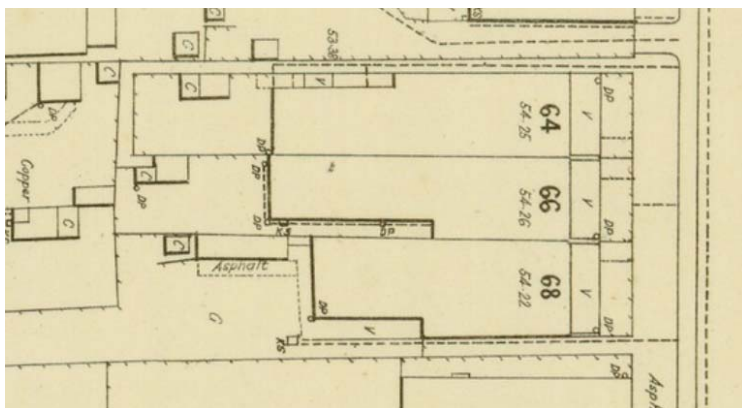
MMBW Detail Plan no. 963, dated 1898 (source: SLV).
